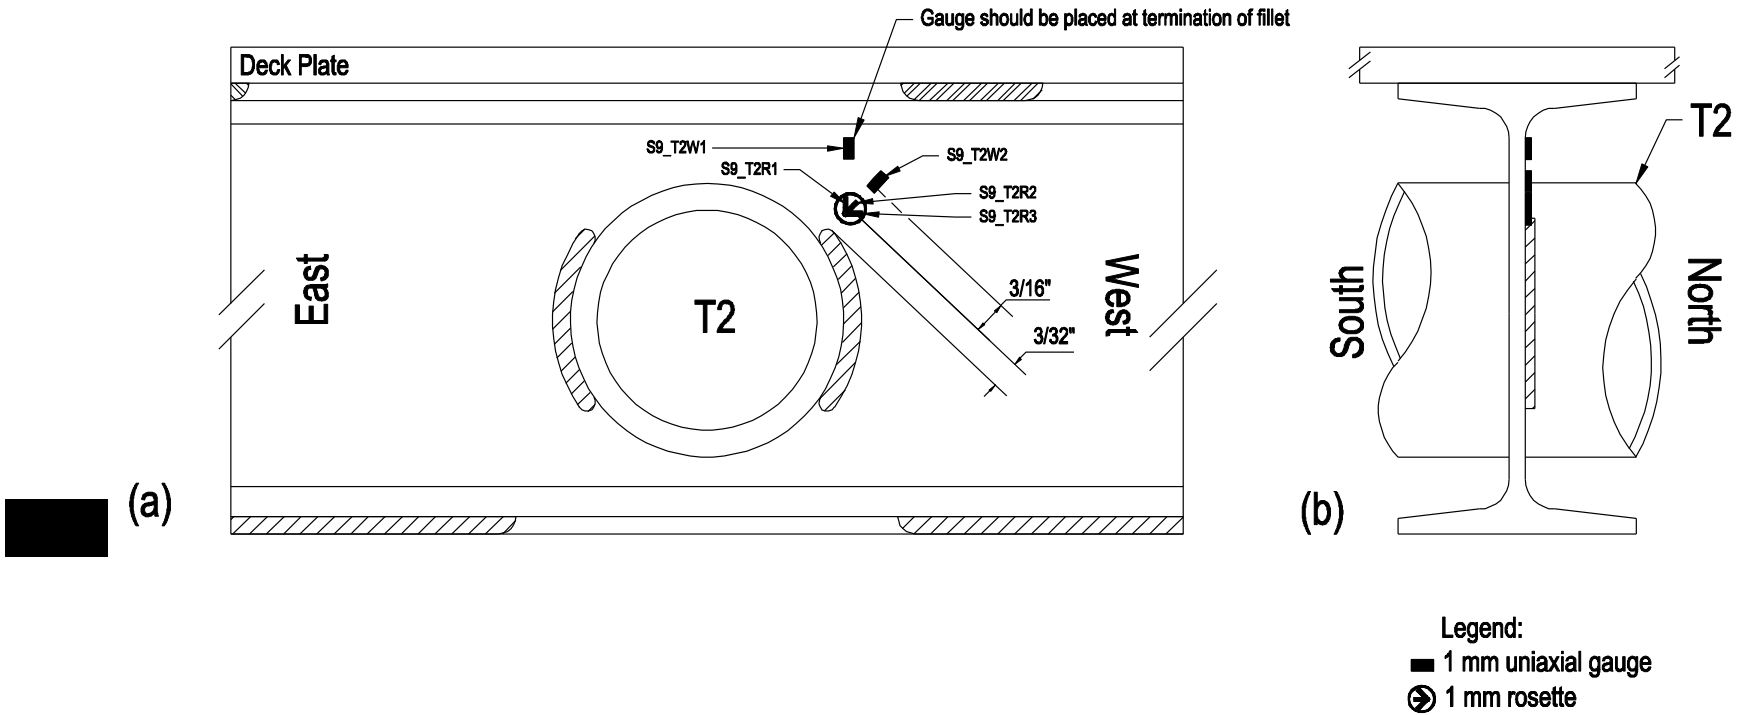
Strain gauge layout of at S9-to-T2 connection for Specimen #2: (a) part north elevation, (b) section view
